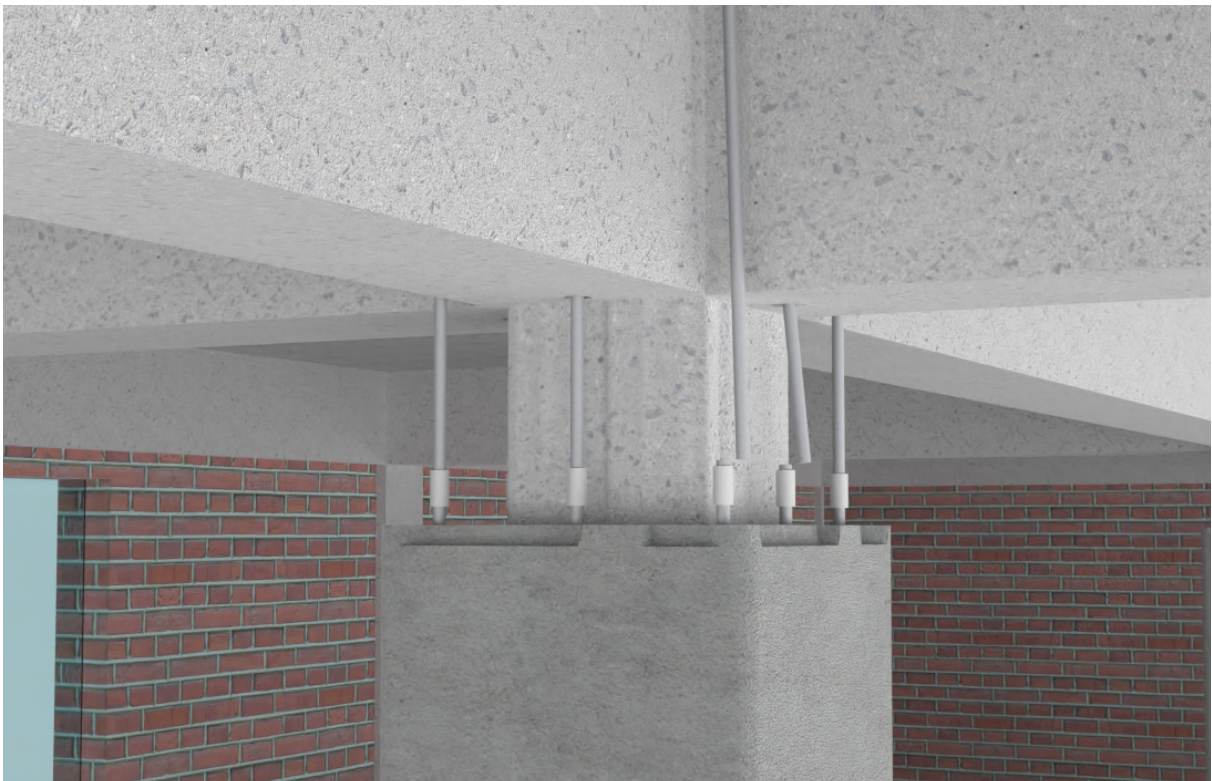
Step 9: The placement of the modular block and stirrup elements follow one another in combination with placing the shear dowel in the pre-drilled holes in the column and hooking these dowels around the longitudinal rebars. This process is repeated until the end of the longitudinal rebar is reached.
